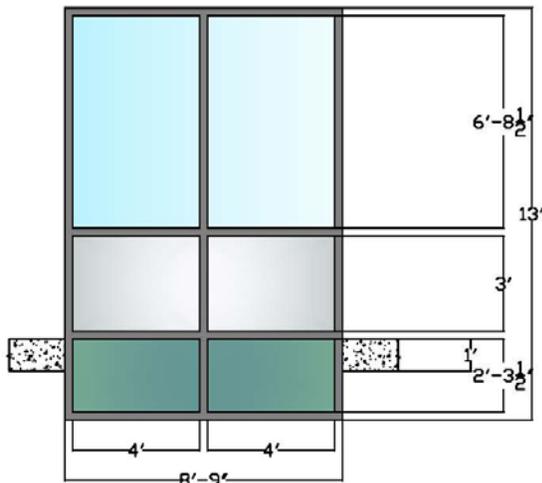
7/6/07: Glass installation on south elevation, excluding fritted glass
